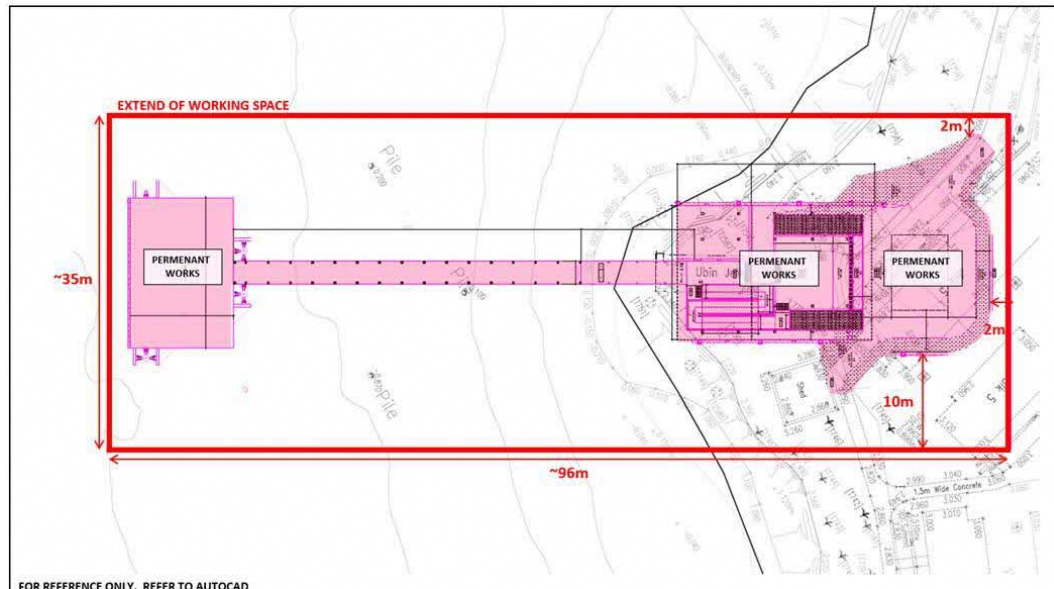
Plan view of the proposed jetty and arrival pavilion, including the proposed working space around the jetty (Source: PAL Consultancy)
